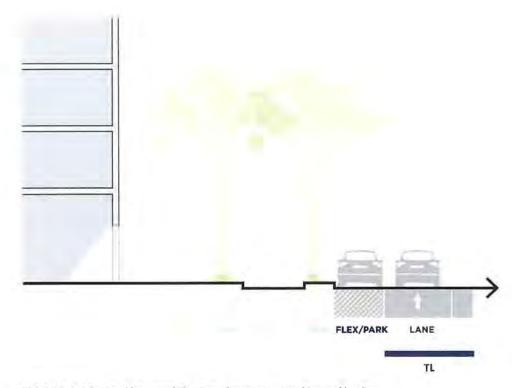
Travel lanes and Flex Zone for on-street parking and loading
